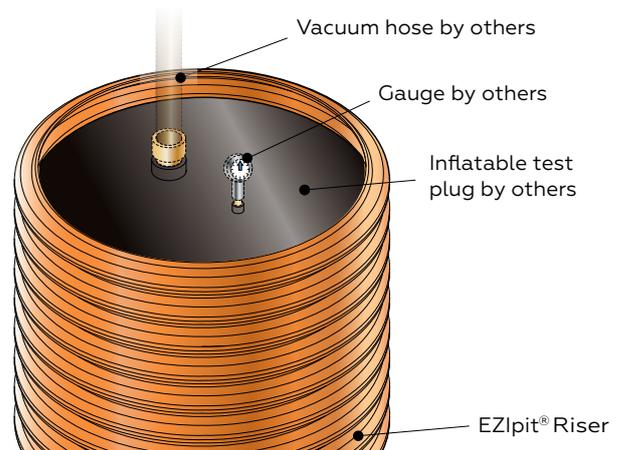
Test plug assembled in EZIpit® Riser ready for test.
